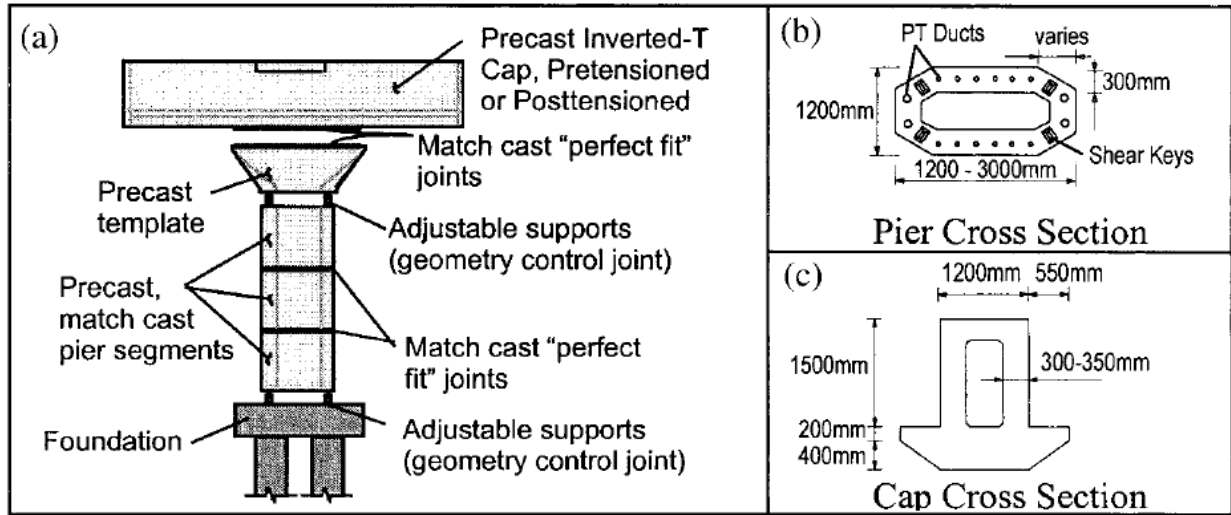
Single-column pier composed of precast components (Billington et al. 2001)
